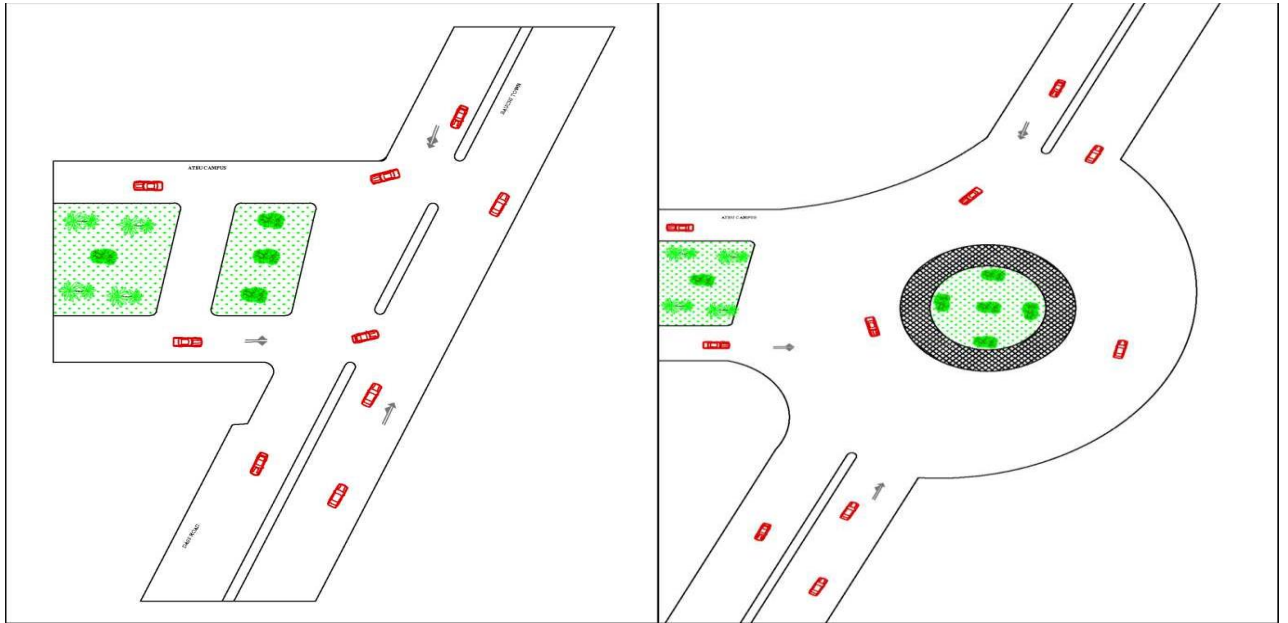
current layout of main gate intersection movements    Fig 8. Proposed roundabout intersection movement
